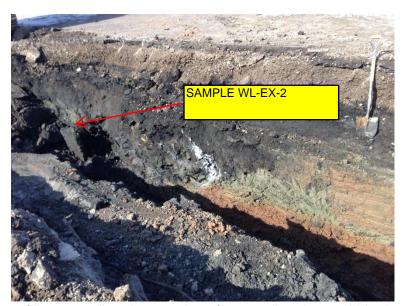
Urban fill surrounding the remains of a 55-gallon drum within the water utility line excavation facing southwest
